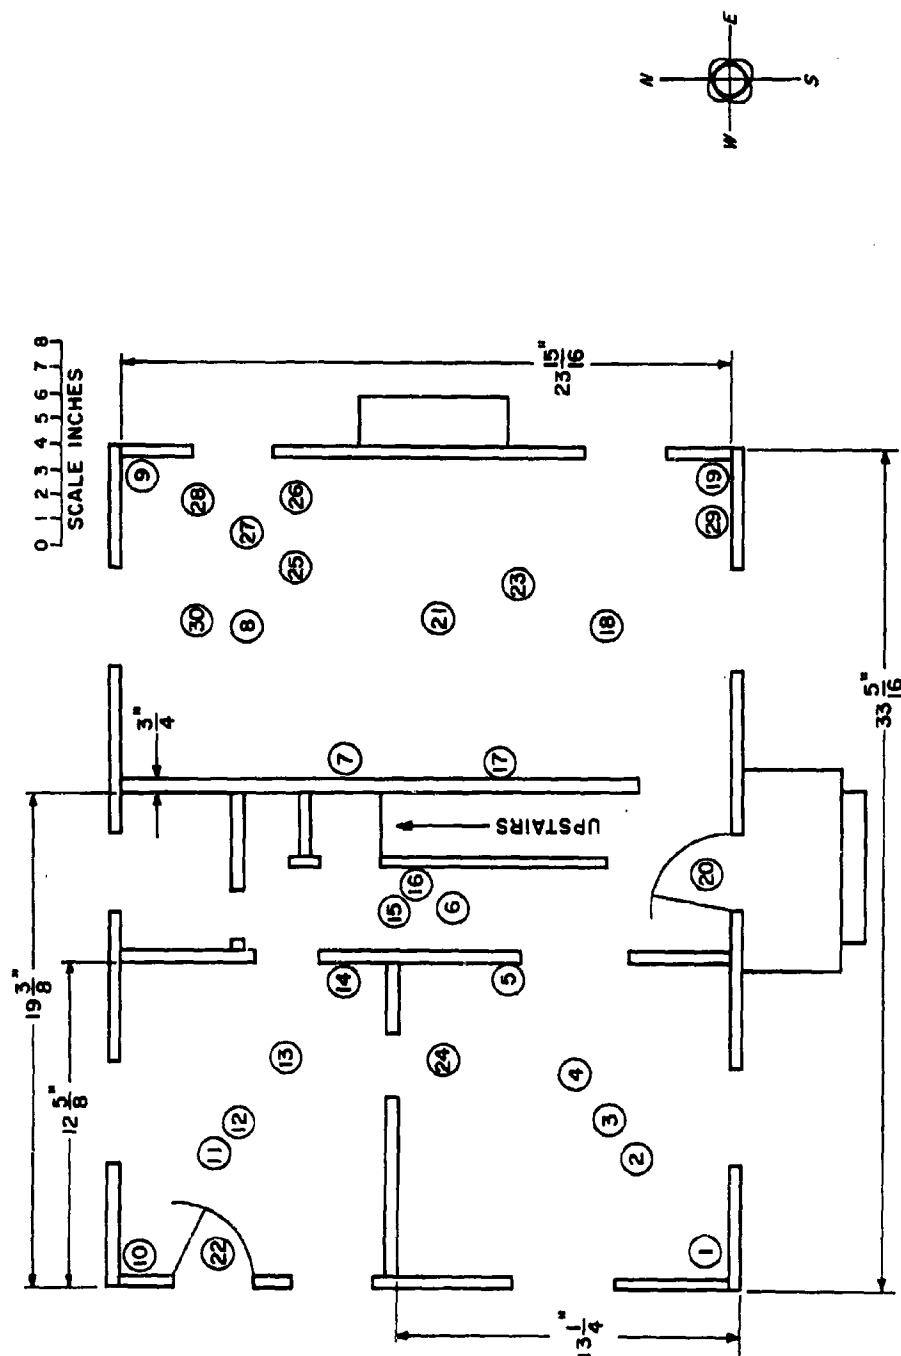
Plan View of First Floor Giving All Dosimeter Locations for Two-Story House
